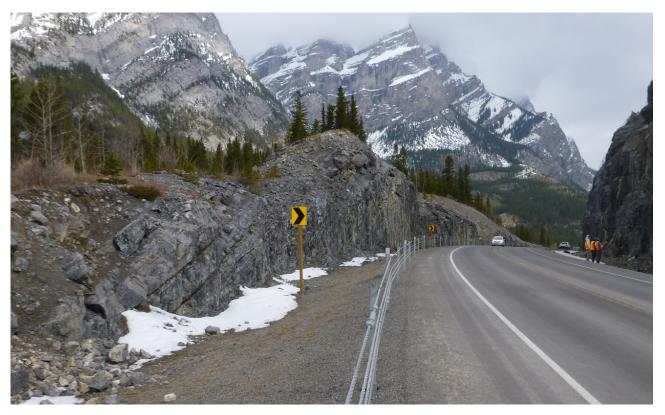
Minor rockfall on the road. Photo was taken facing north on May 7, 2019.
